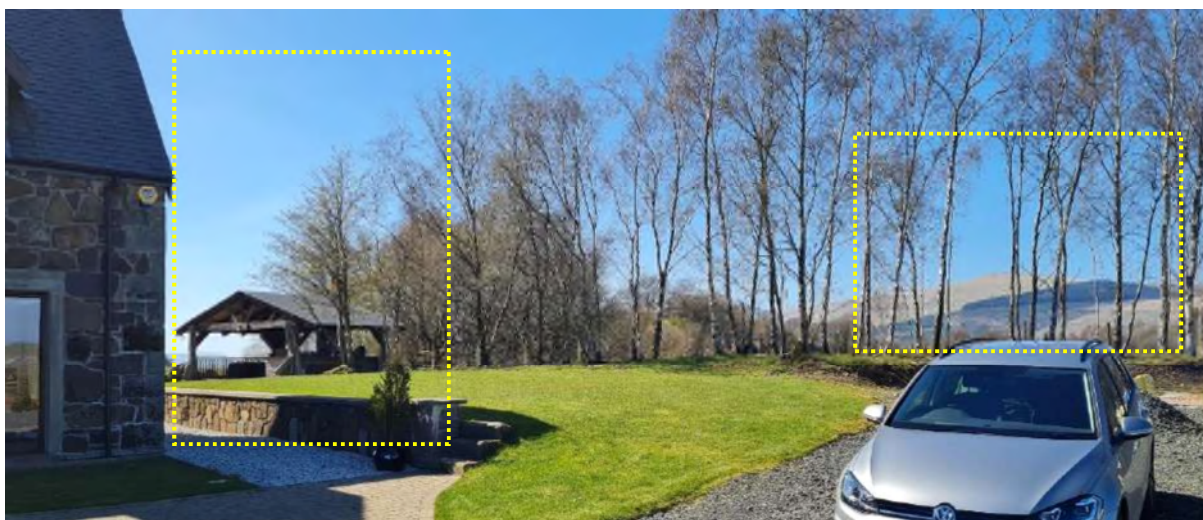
Location of existing outbuildings/structures within approved curtilage ■ and further approved works ○
